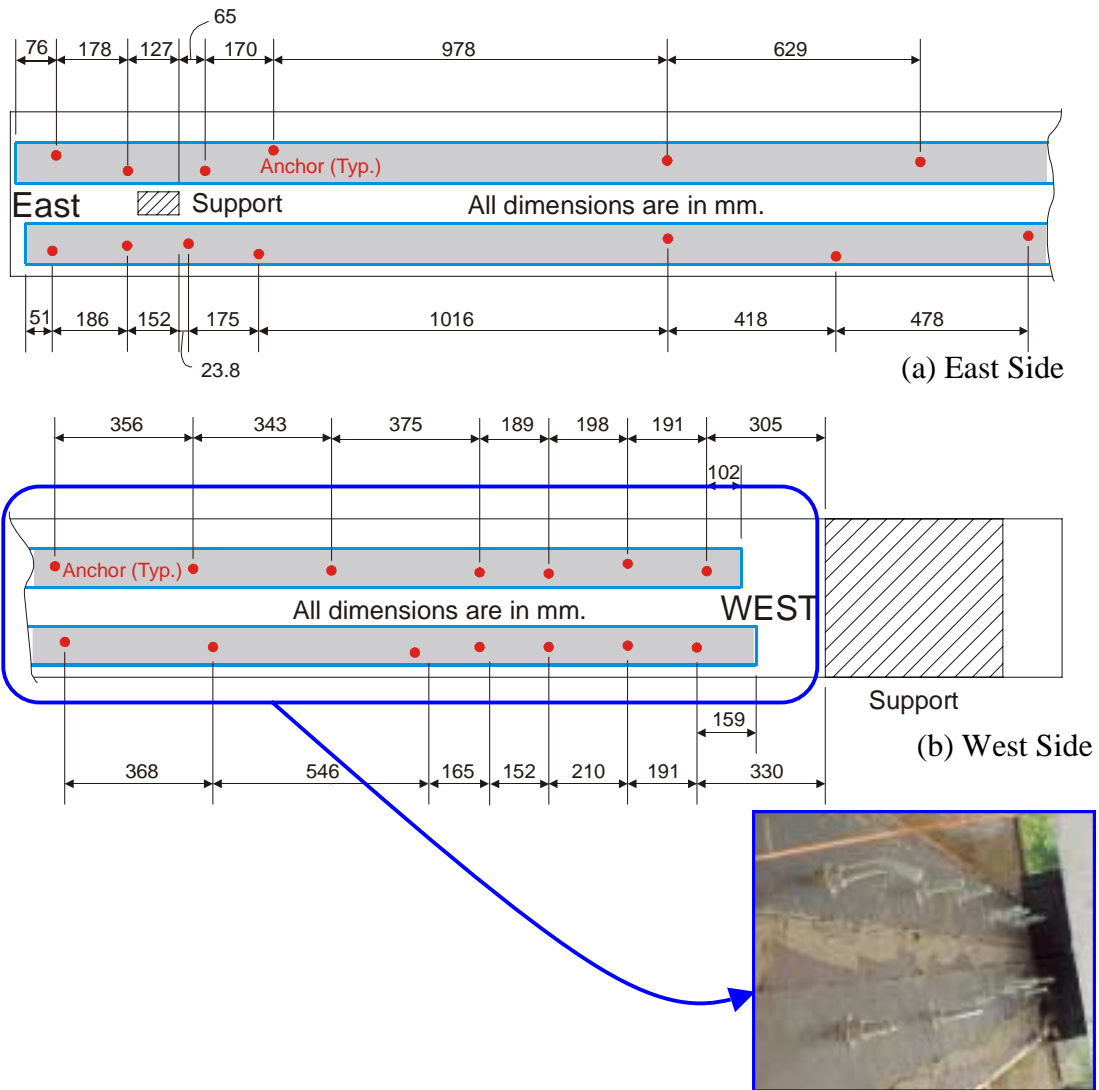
Bottom Views of Mechanical Anchorage in Beam 4
